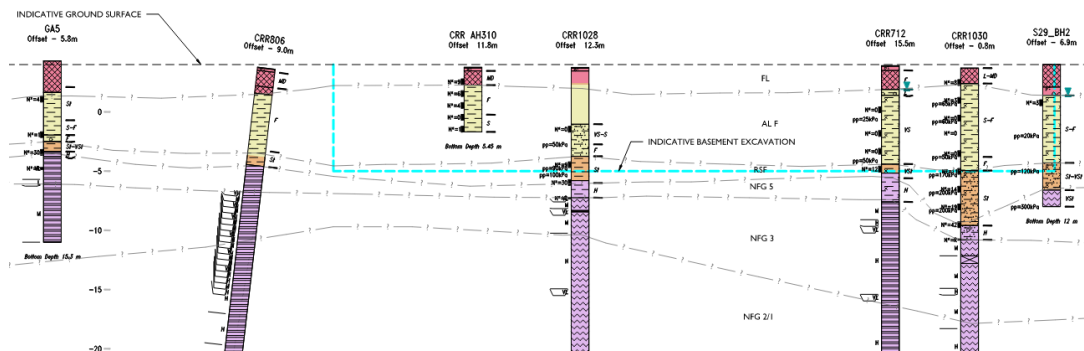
EDG Interpreted Geotechnical Section D – Looking towards Albert Street
